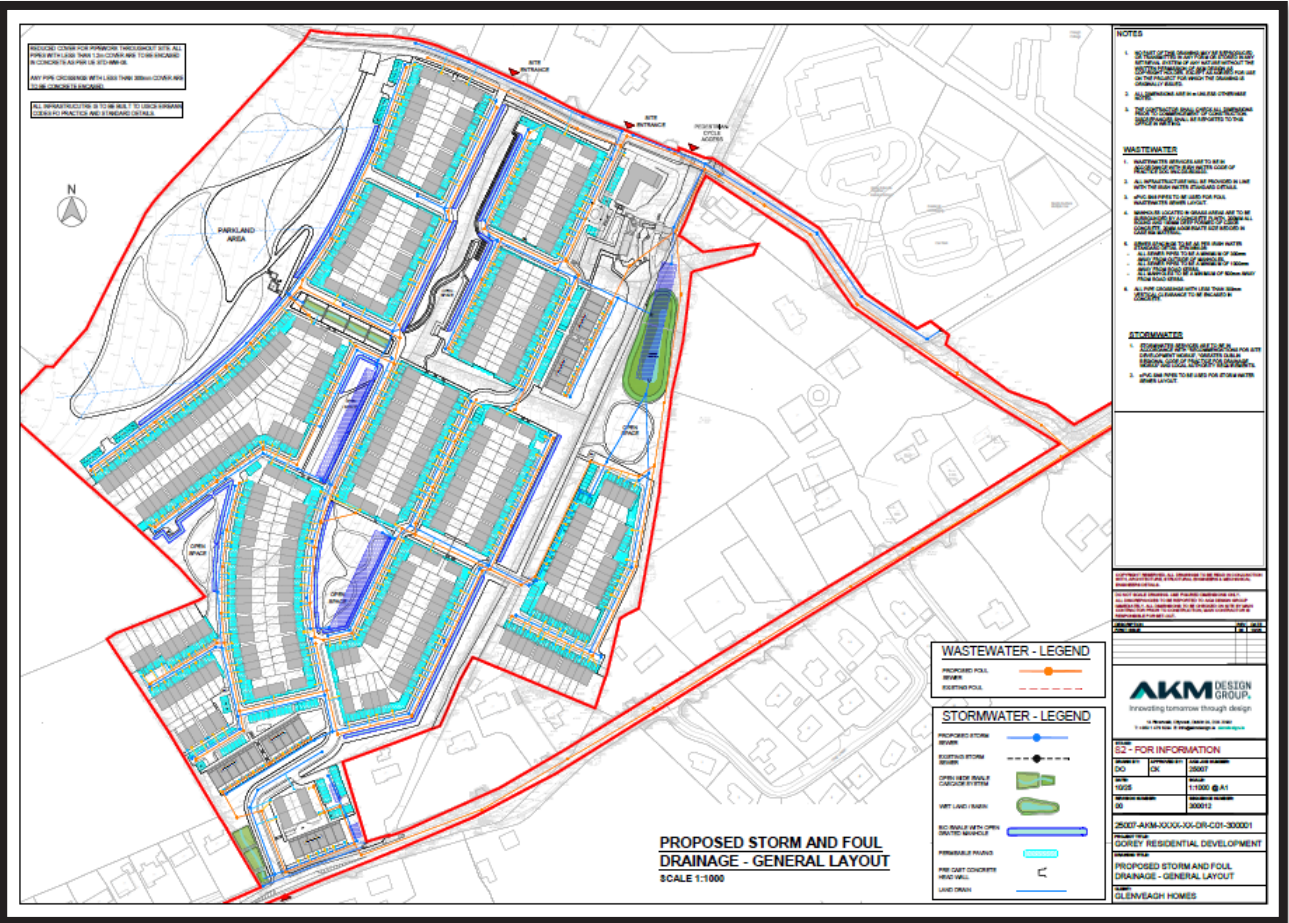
Proposed Storm and Foul Drainage Layout from AKM the project design engineers.
